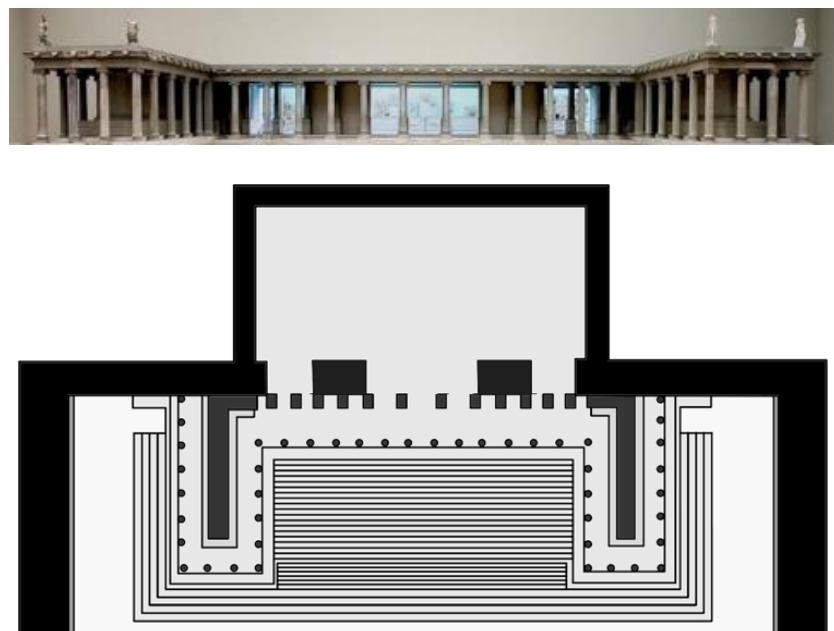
View from the Pergamon room, looking towards the Telephos Room and partial plan drawn by the author, over an original drawing.
